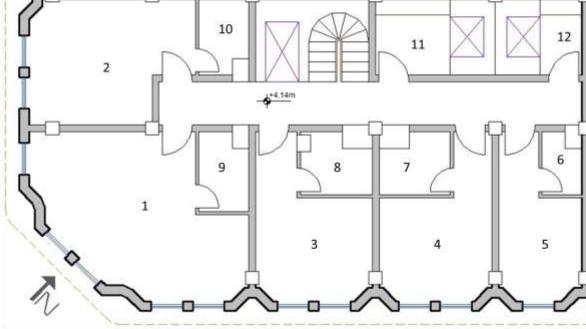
First Floor Plan (after conservation) (Dersaadet Hotel)
